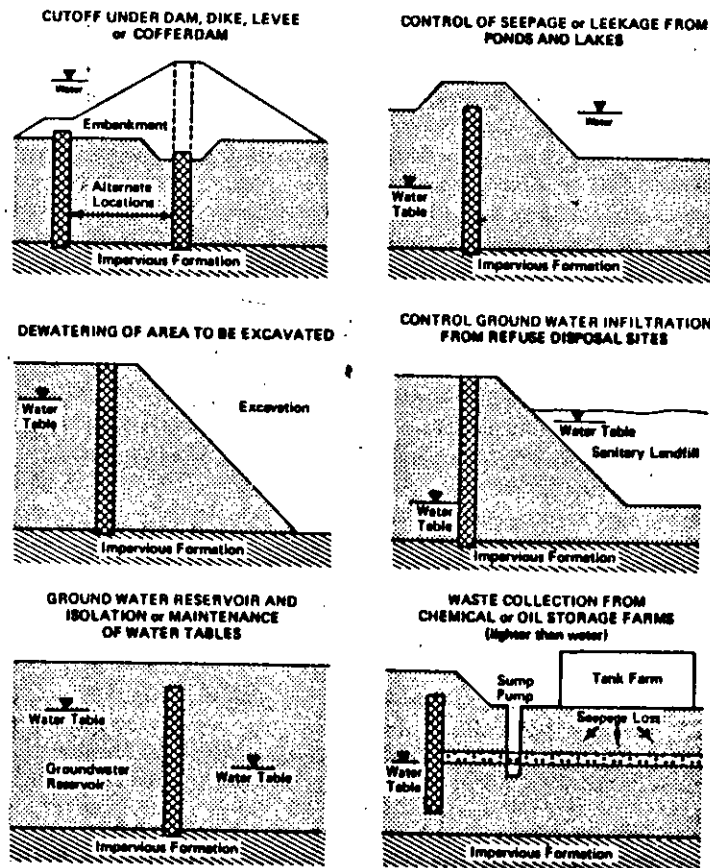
Typical Applications of Slurry Trench Cutoff Wall
